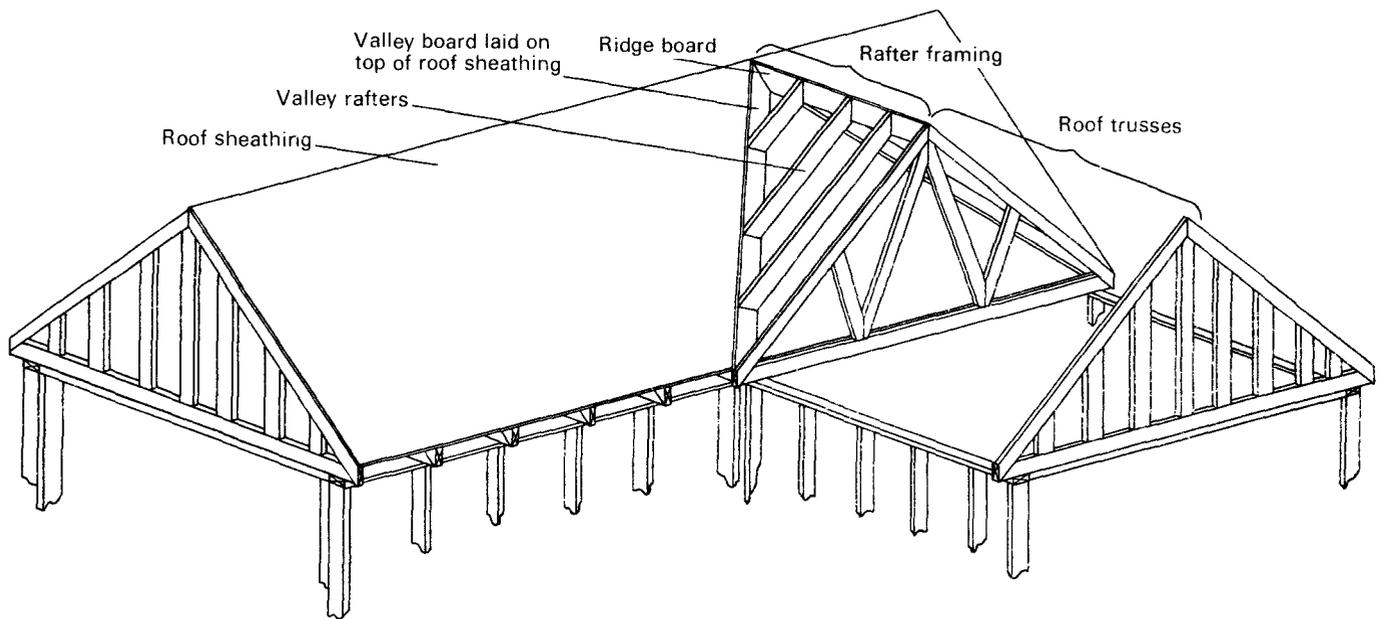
Rafter framing joining perpendicular truss roof segments.
